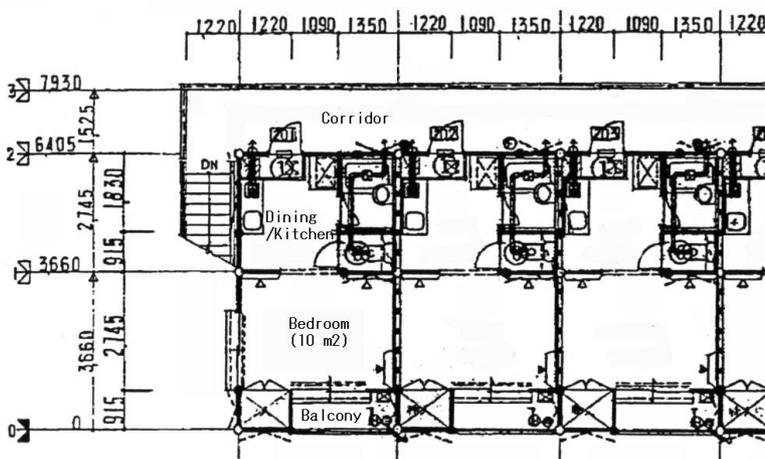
Existing plan of 2<sup>nd</sup> floor (partial) and exterior
